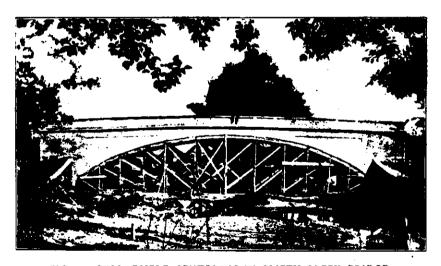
COLLAPSIBLE CENTERING IN CLIFTY CREEK BRIDGE (See pages 38 and 39.)
